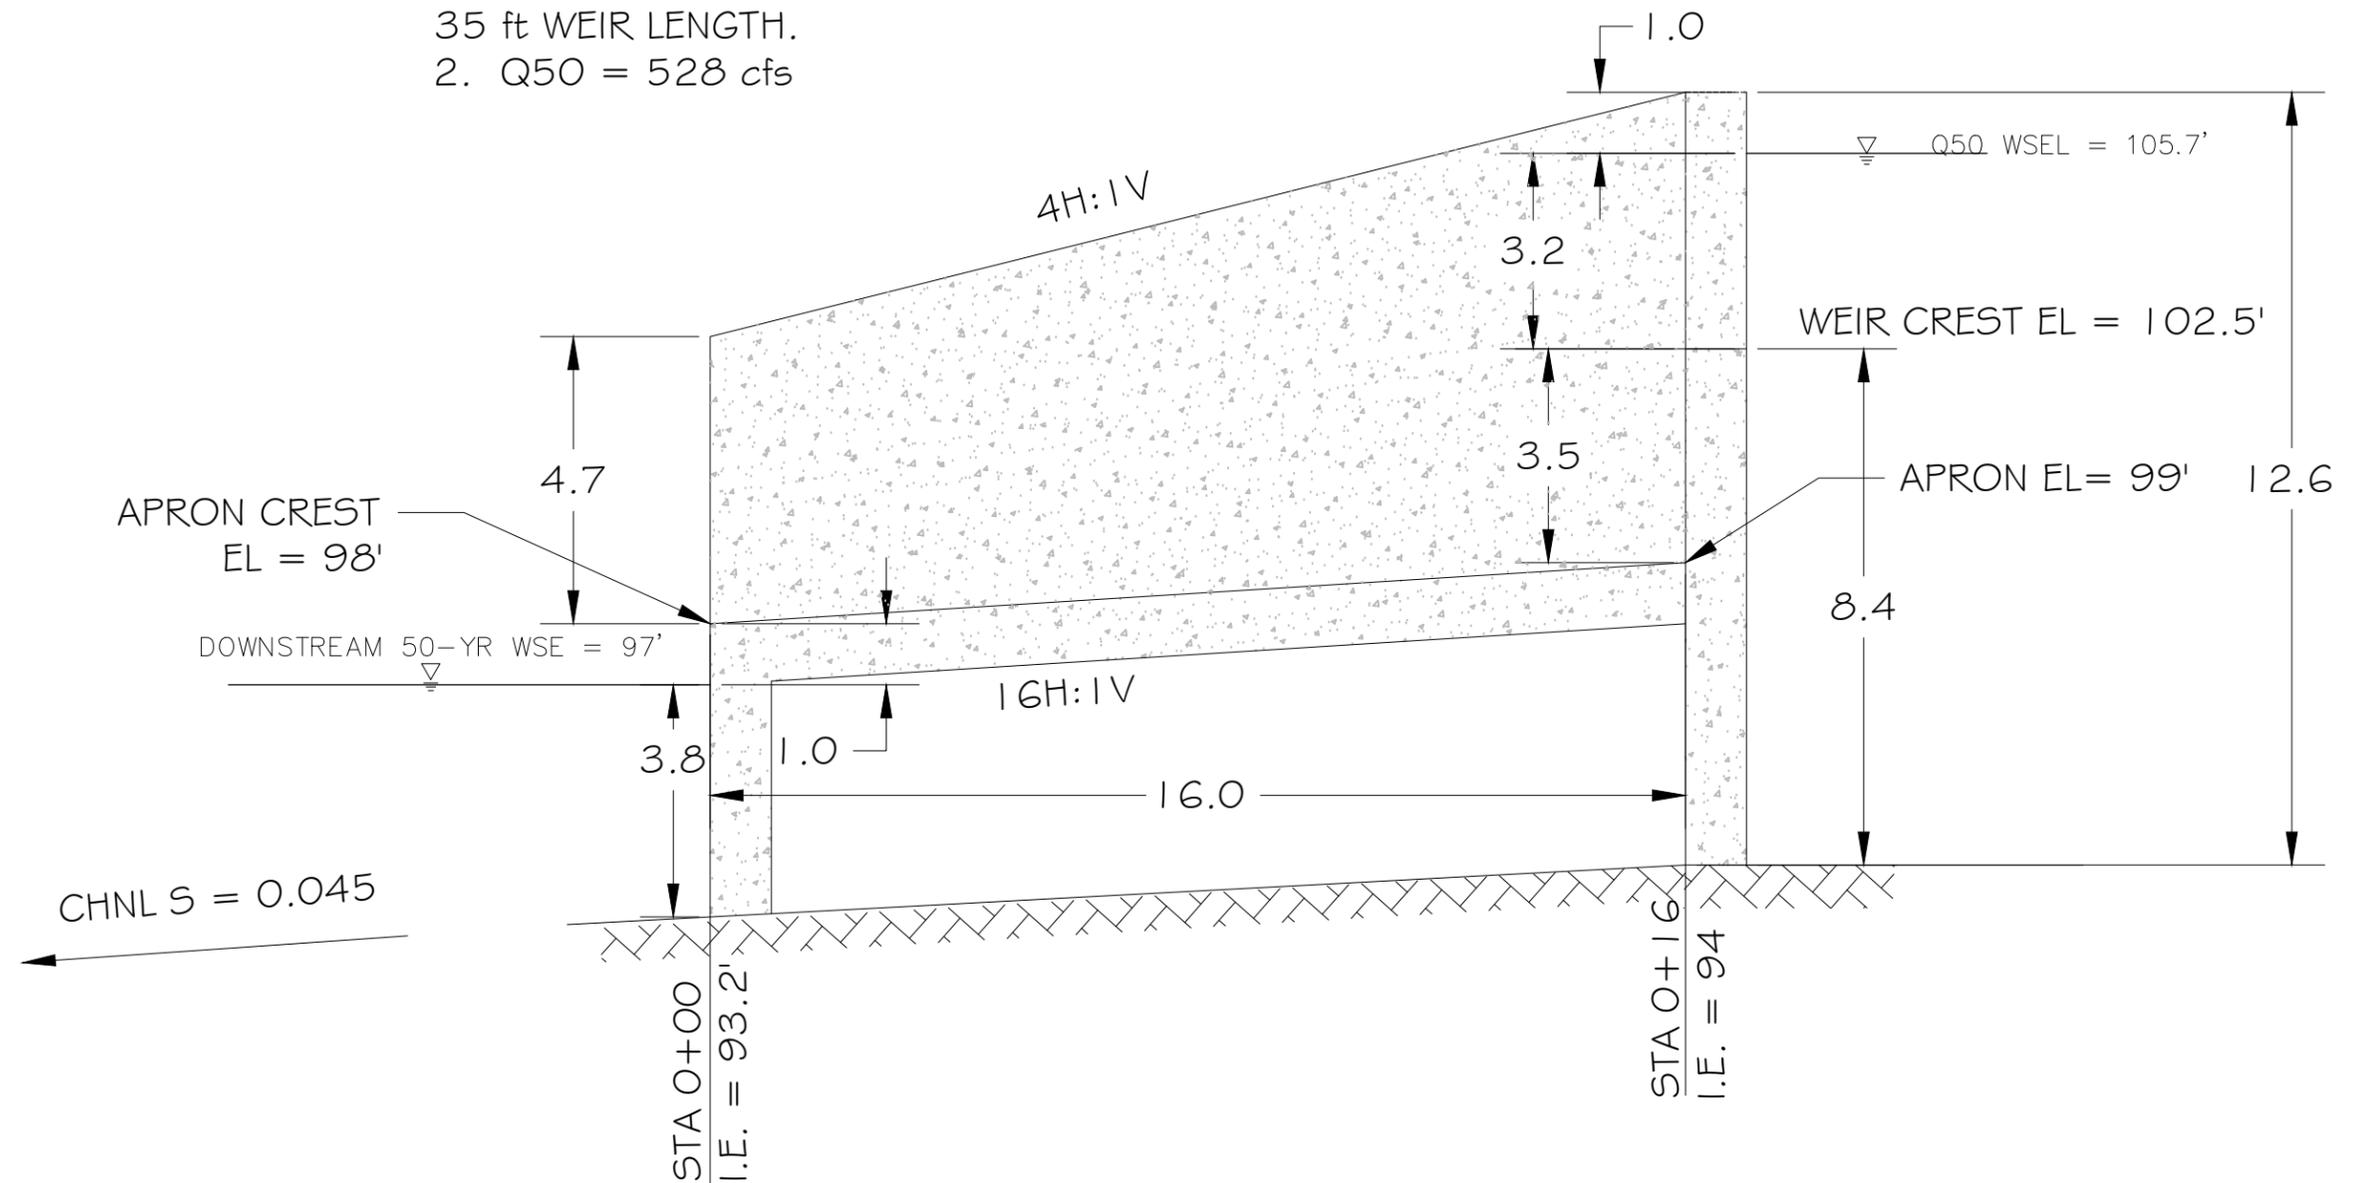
North Fork Spanish Creek Conceptual Fish Barrier Section
